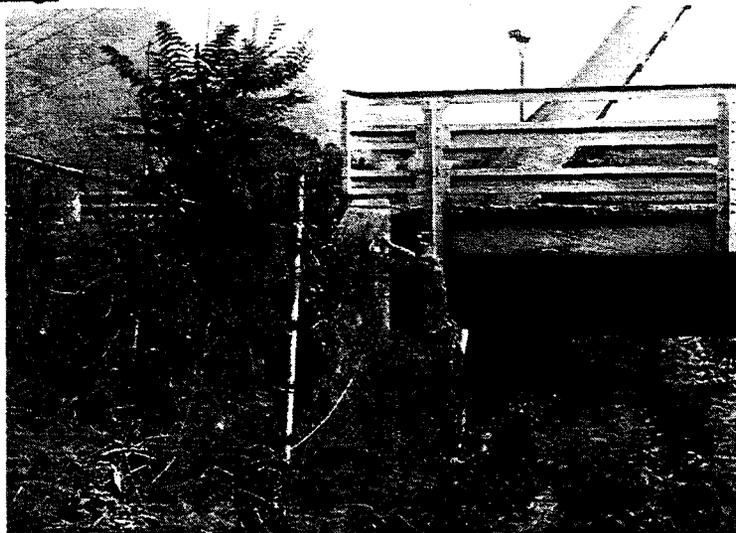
Bridge 119/26 left U/S abutment. The tie-back Wall begins(STA. 0+0.0) at this location.
